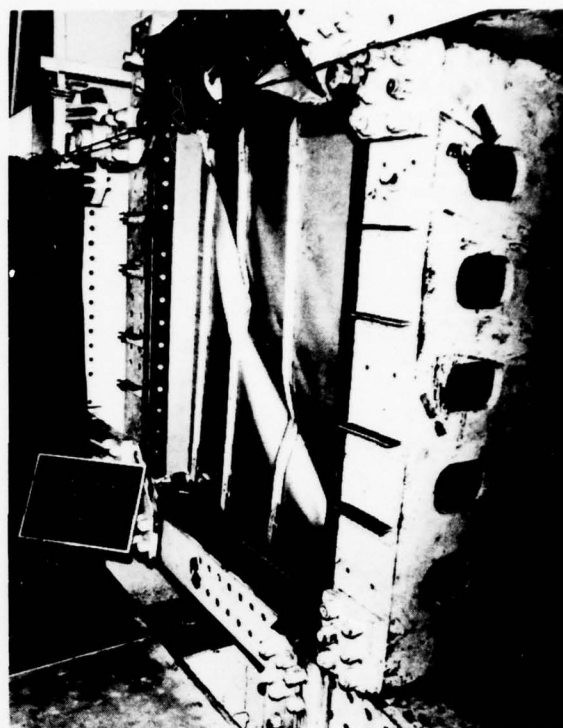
SHEAR TEST FAILURE - FRONT VIEW
